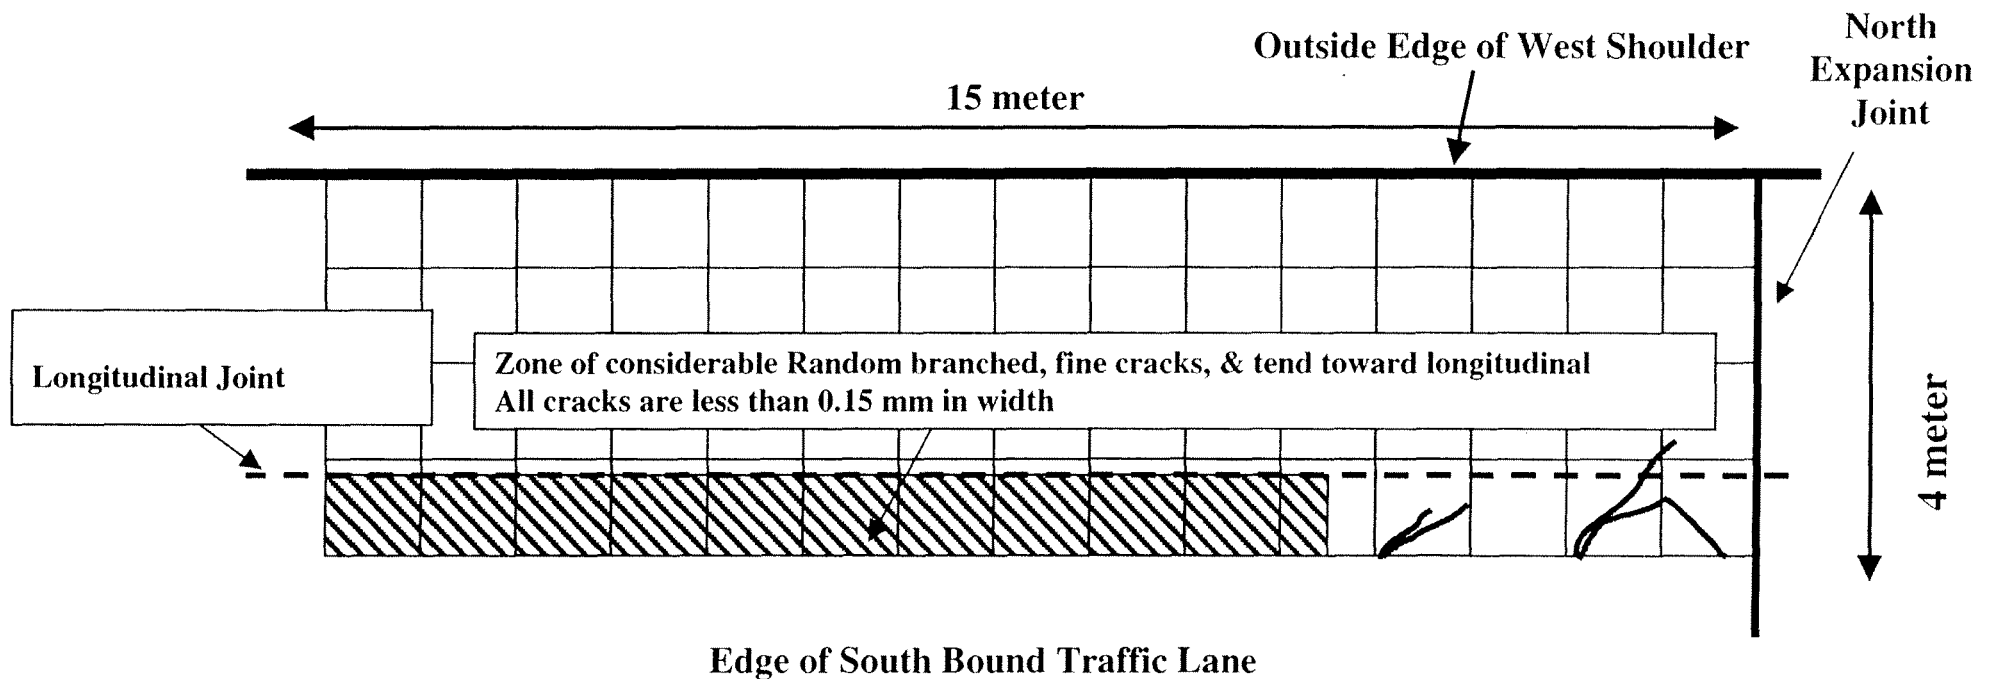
I-225 Structure Over Colfax Avenue, South Bound, Outside Shoulder
